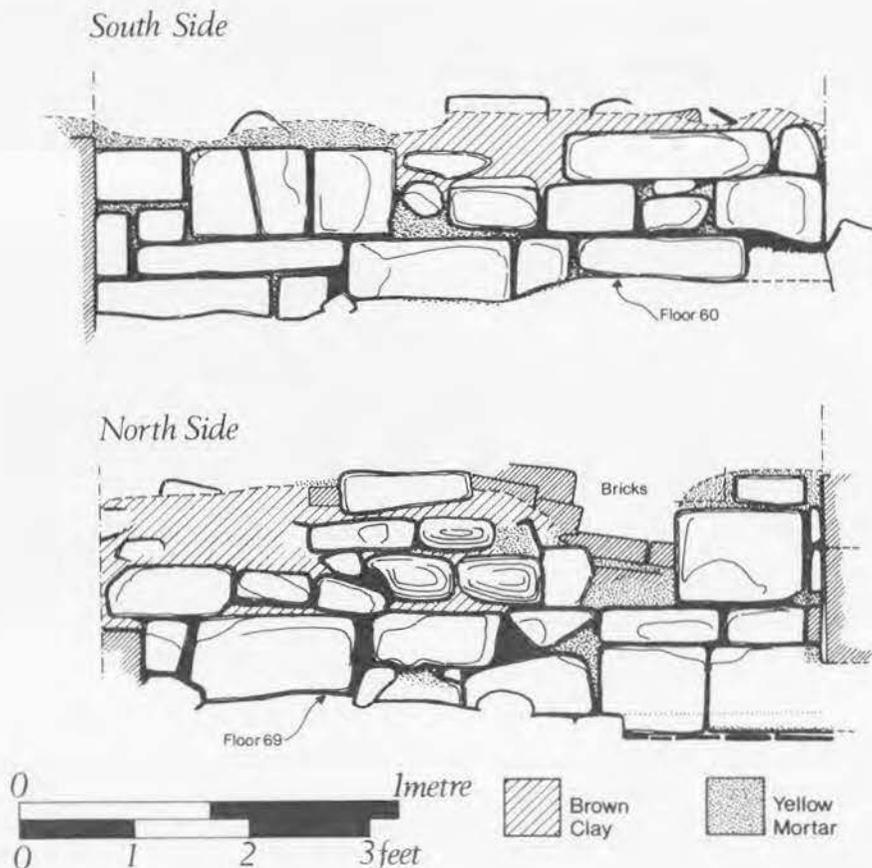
43 High Street. Probable malting kiln. Elevations of north and south stone walls of stoking chamber.
